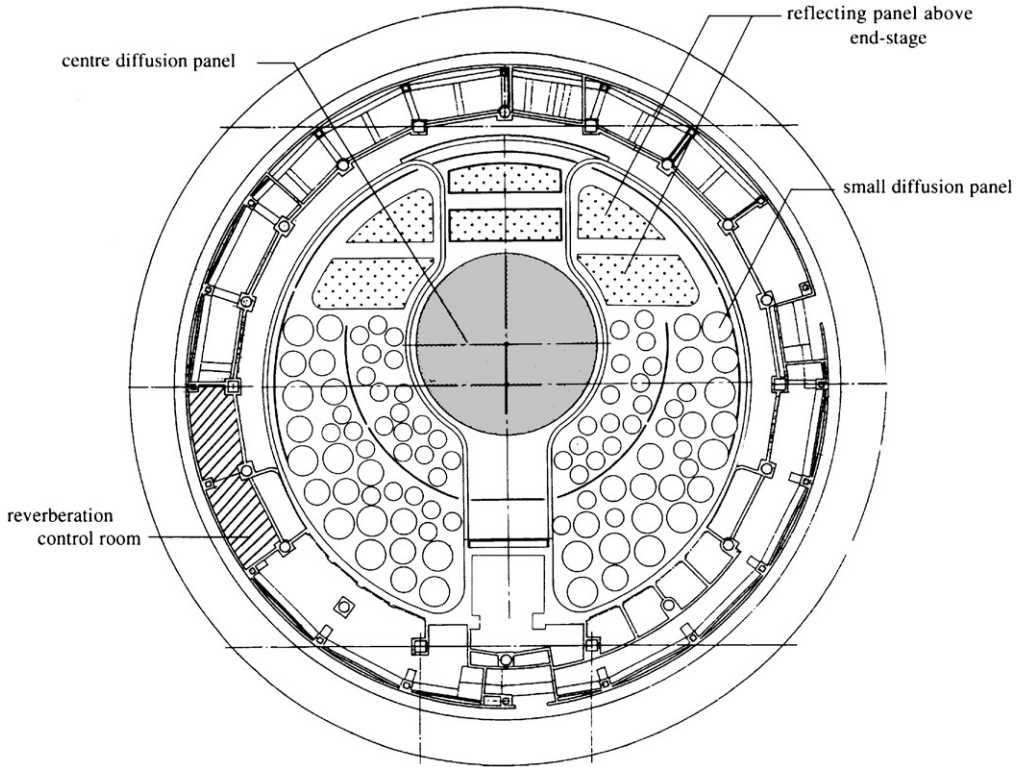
Ceiling plan of Orbis Hall with various acoustic equipments.
